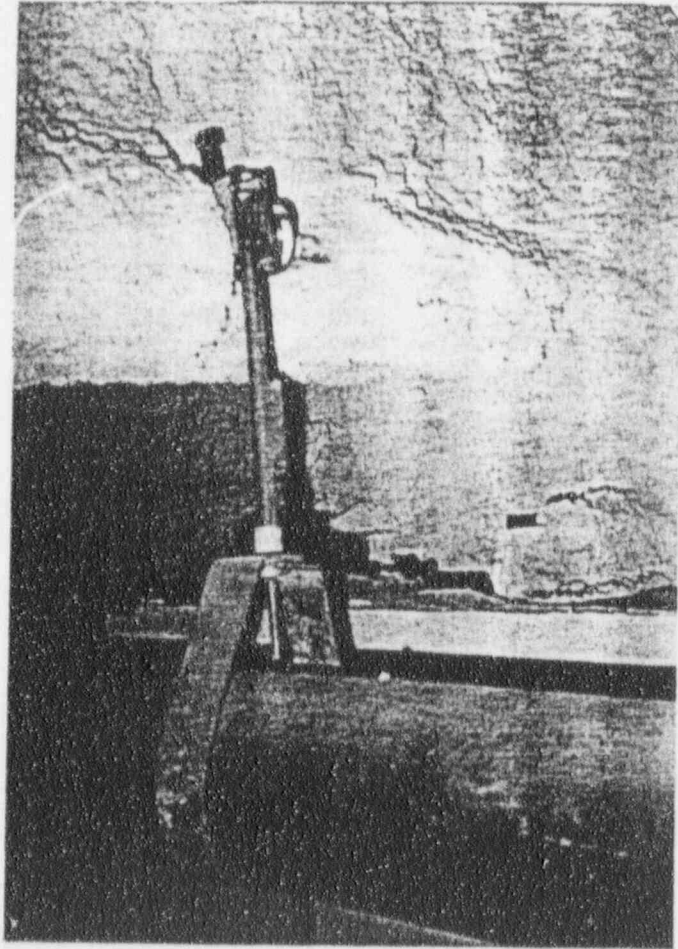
Example of rod hanger for Sanwa fire protection piping. Support is anchored to structure with a beam clamp.
